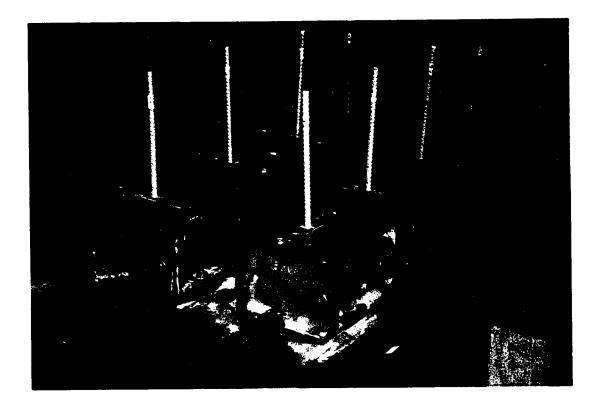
Typical Steel Molds with 12 mm Diameter Steel Bars
